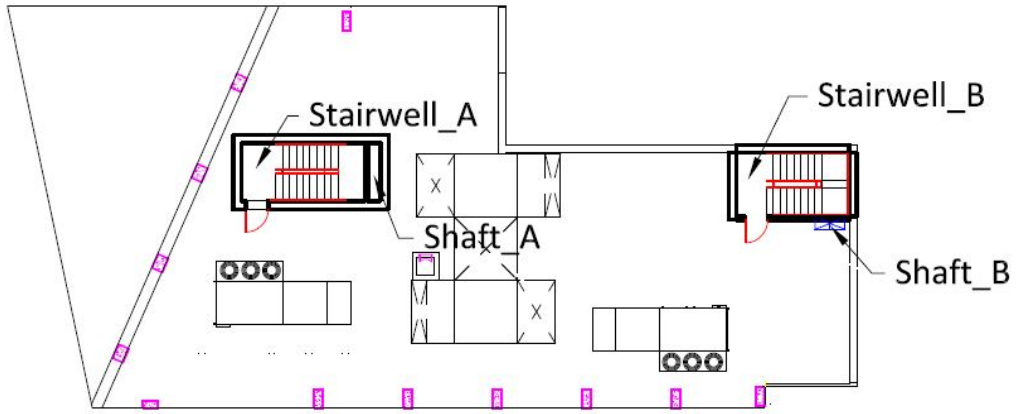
Roof floor plan showing stairwells and shafts exposed to exterior conditions.
